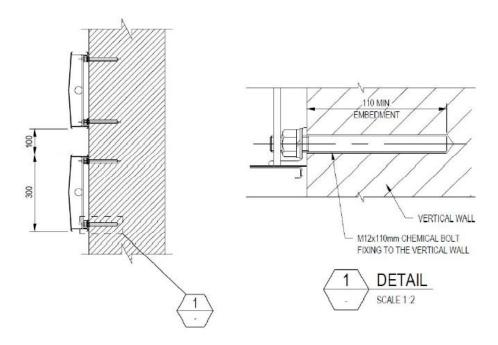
Cable ladder and chemical anchor general arrangement to replace GST in Tunnel 3
